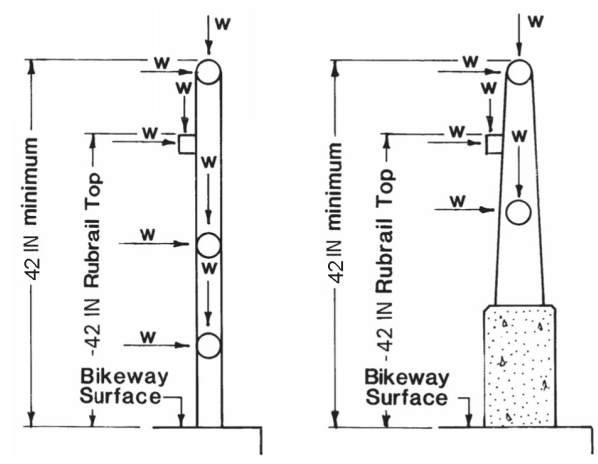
Bicycle Railing Loads—To be used on the outer edge of a bikeway when highway traffic is separated from bicycle traffic by a traffic railing. Railing shape illustrative only.
